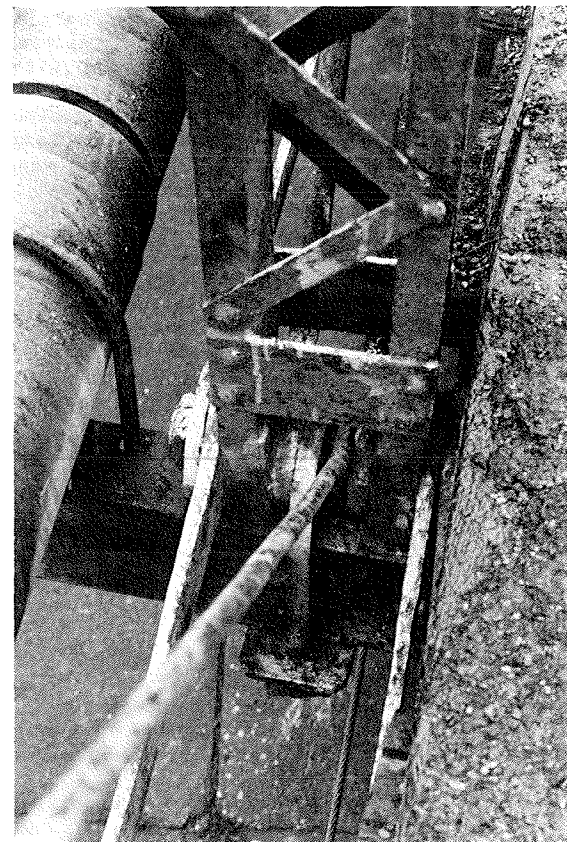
Original bottom pin-U-bolt joint for floor beam.
